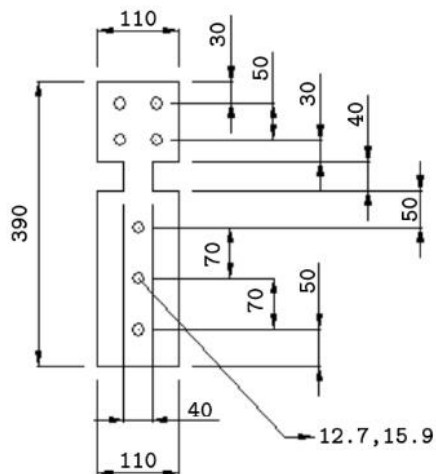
Geometry of the end plates and locations of the strain gauges (dimensions in millimeters) [24]
